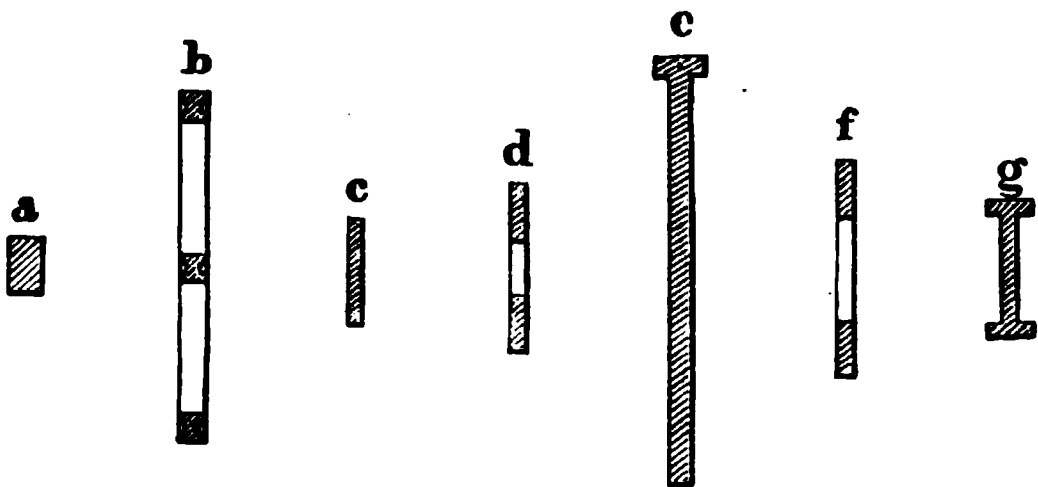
Sections of Ribs of Cast-iron Bridges.
